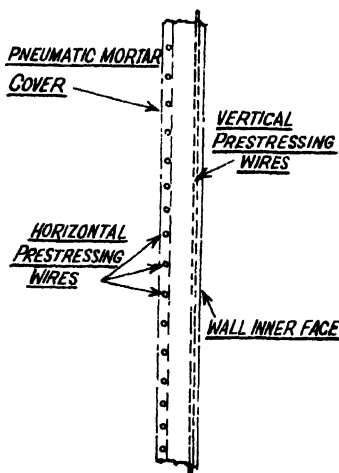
SECTION OF "PRELOAD" TYPE TANK WALL
